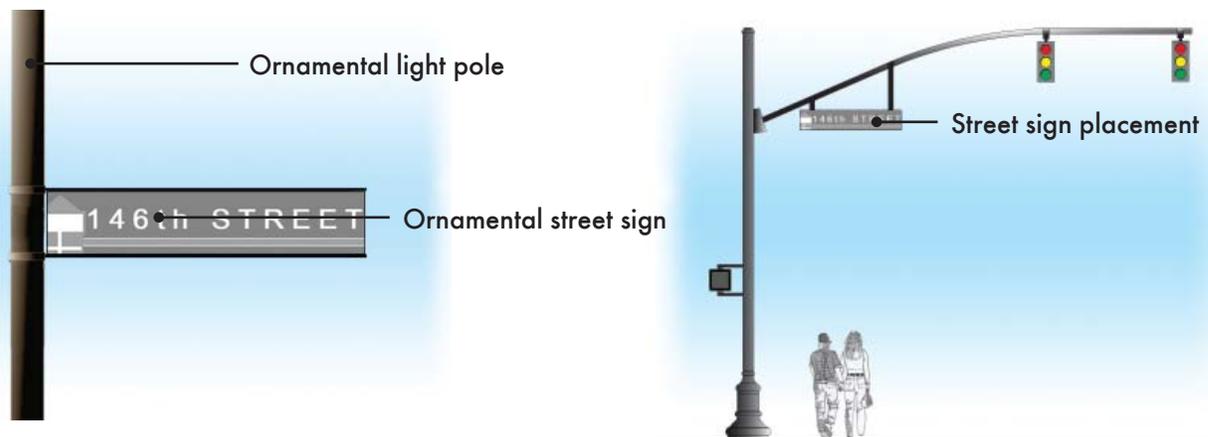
Elevations of proposed street signage and typical placement on decorative signal poles. Street signs are a small detail that helps unify the corridor design theme.
